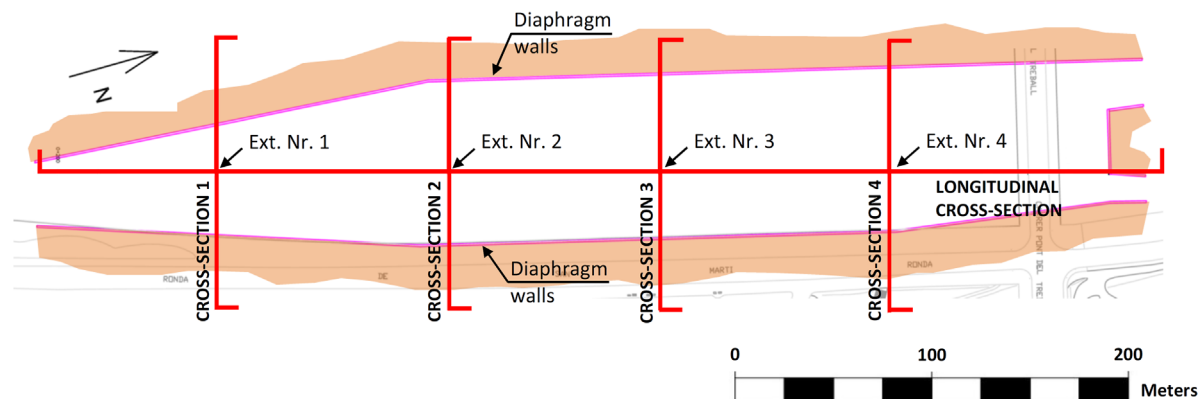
Plant with transversal cross-sections and longitudinal cross-section
